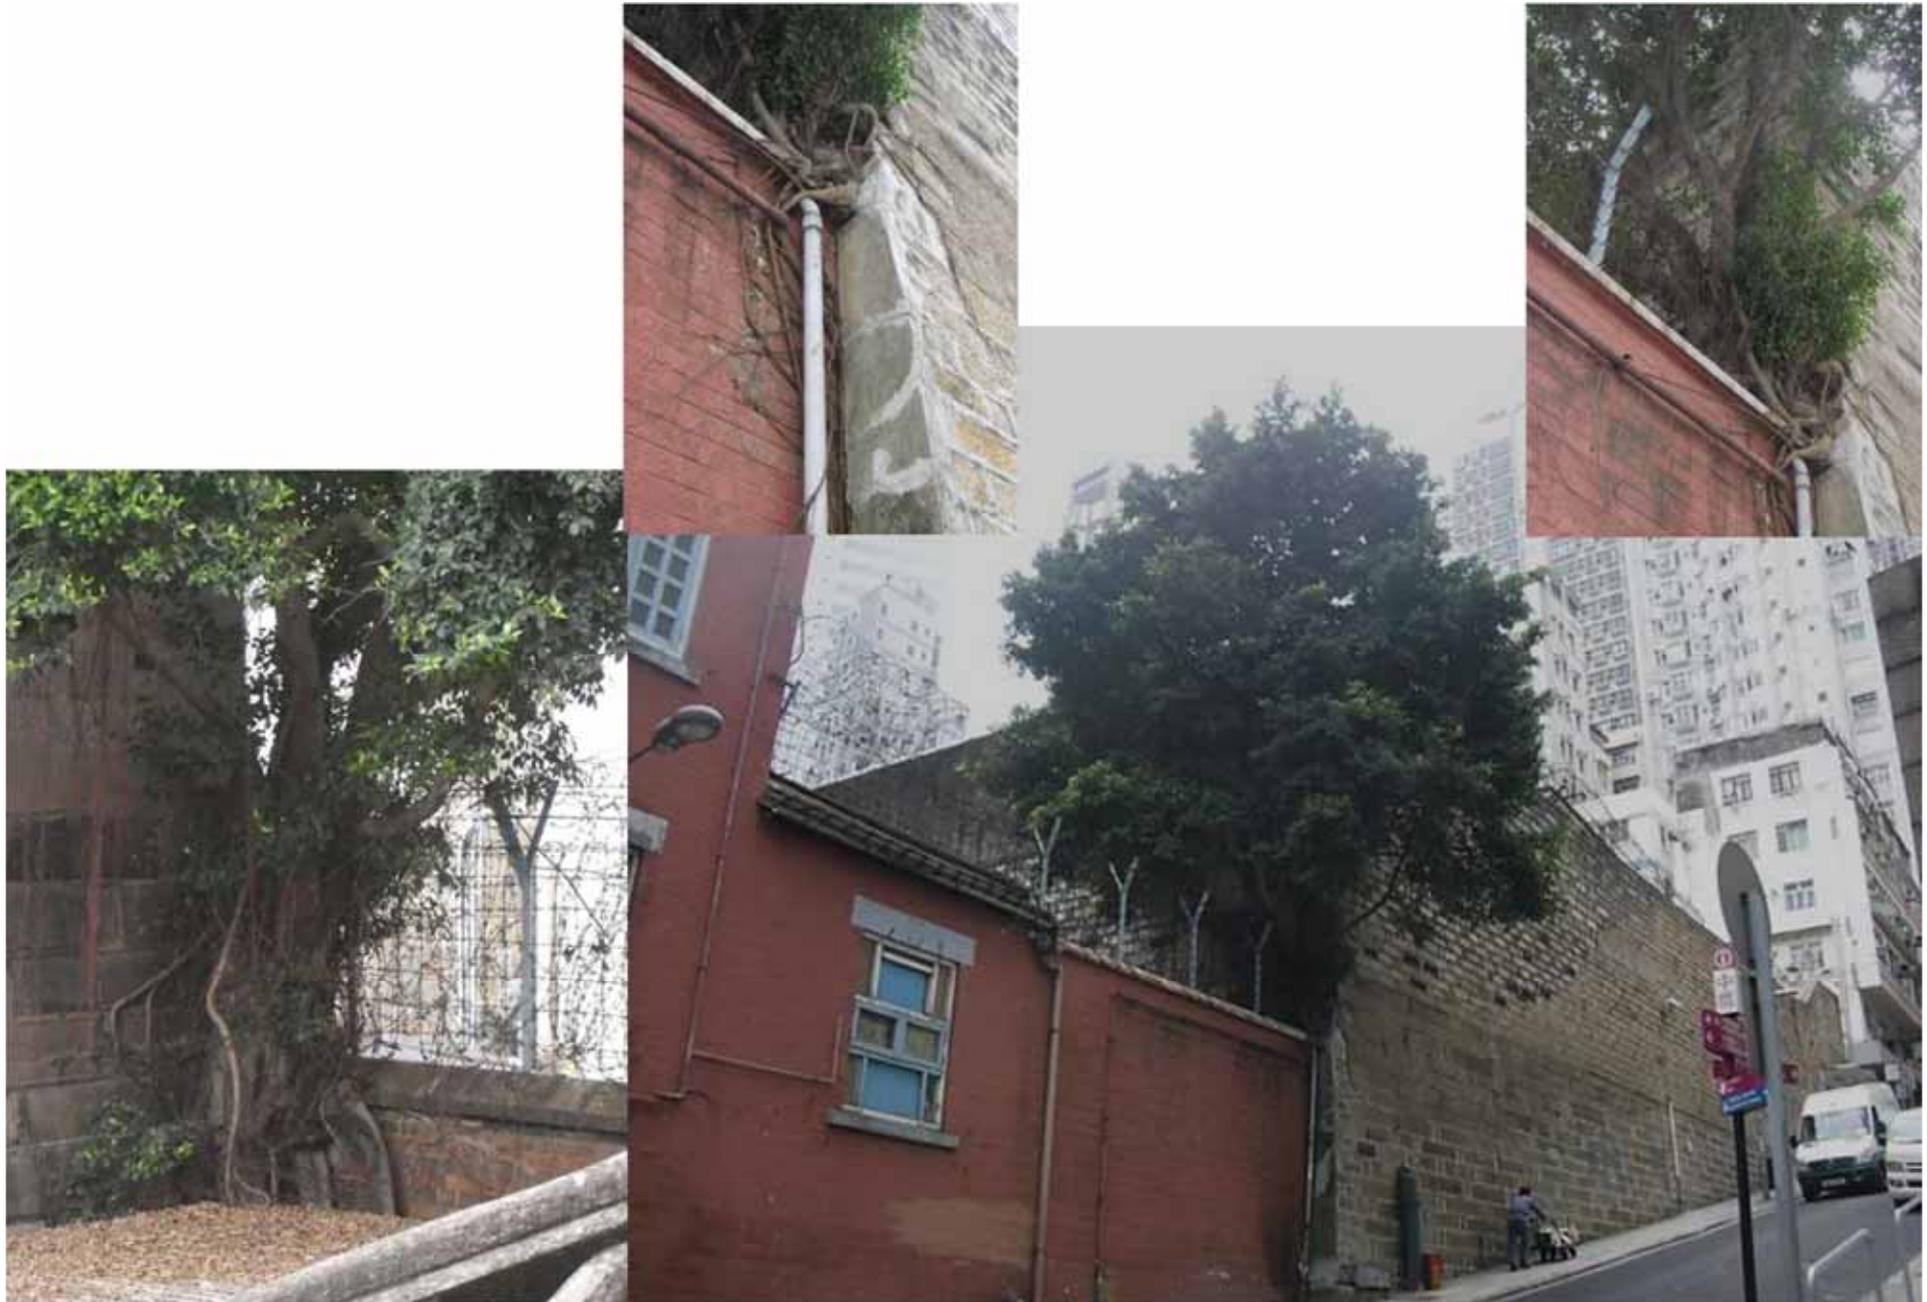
The surface roots of T10 spreads downwards along the stone retaining wall at the end of the narrow alley, and extends to the brick wall at its right.
